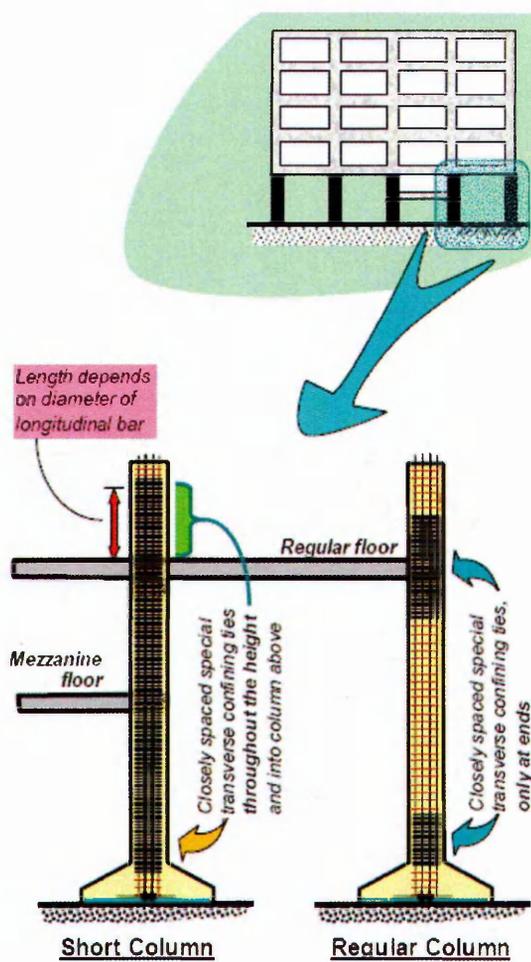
Details of reinforcement in a building with short column effect in some columns (IITK-BMTPC, 2004)
